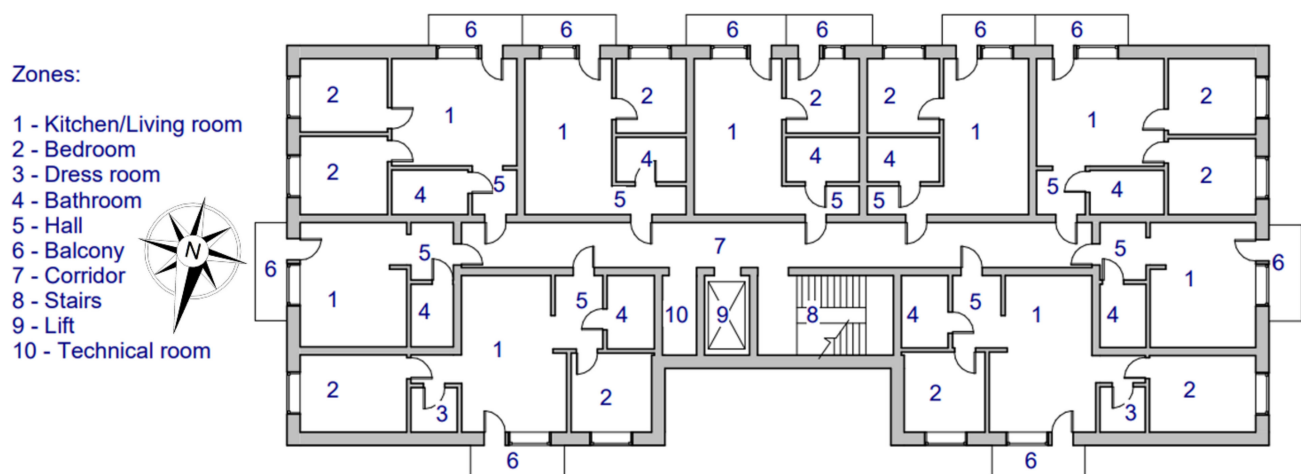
Typical floor plan of the Apartment building in a cold climate (Case Study 2) [87].
